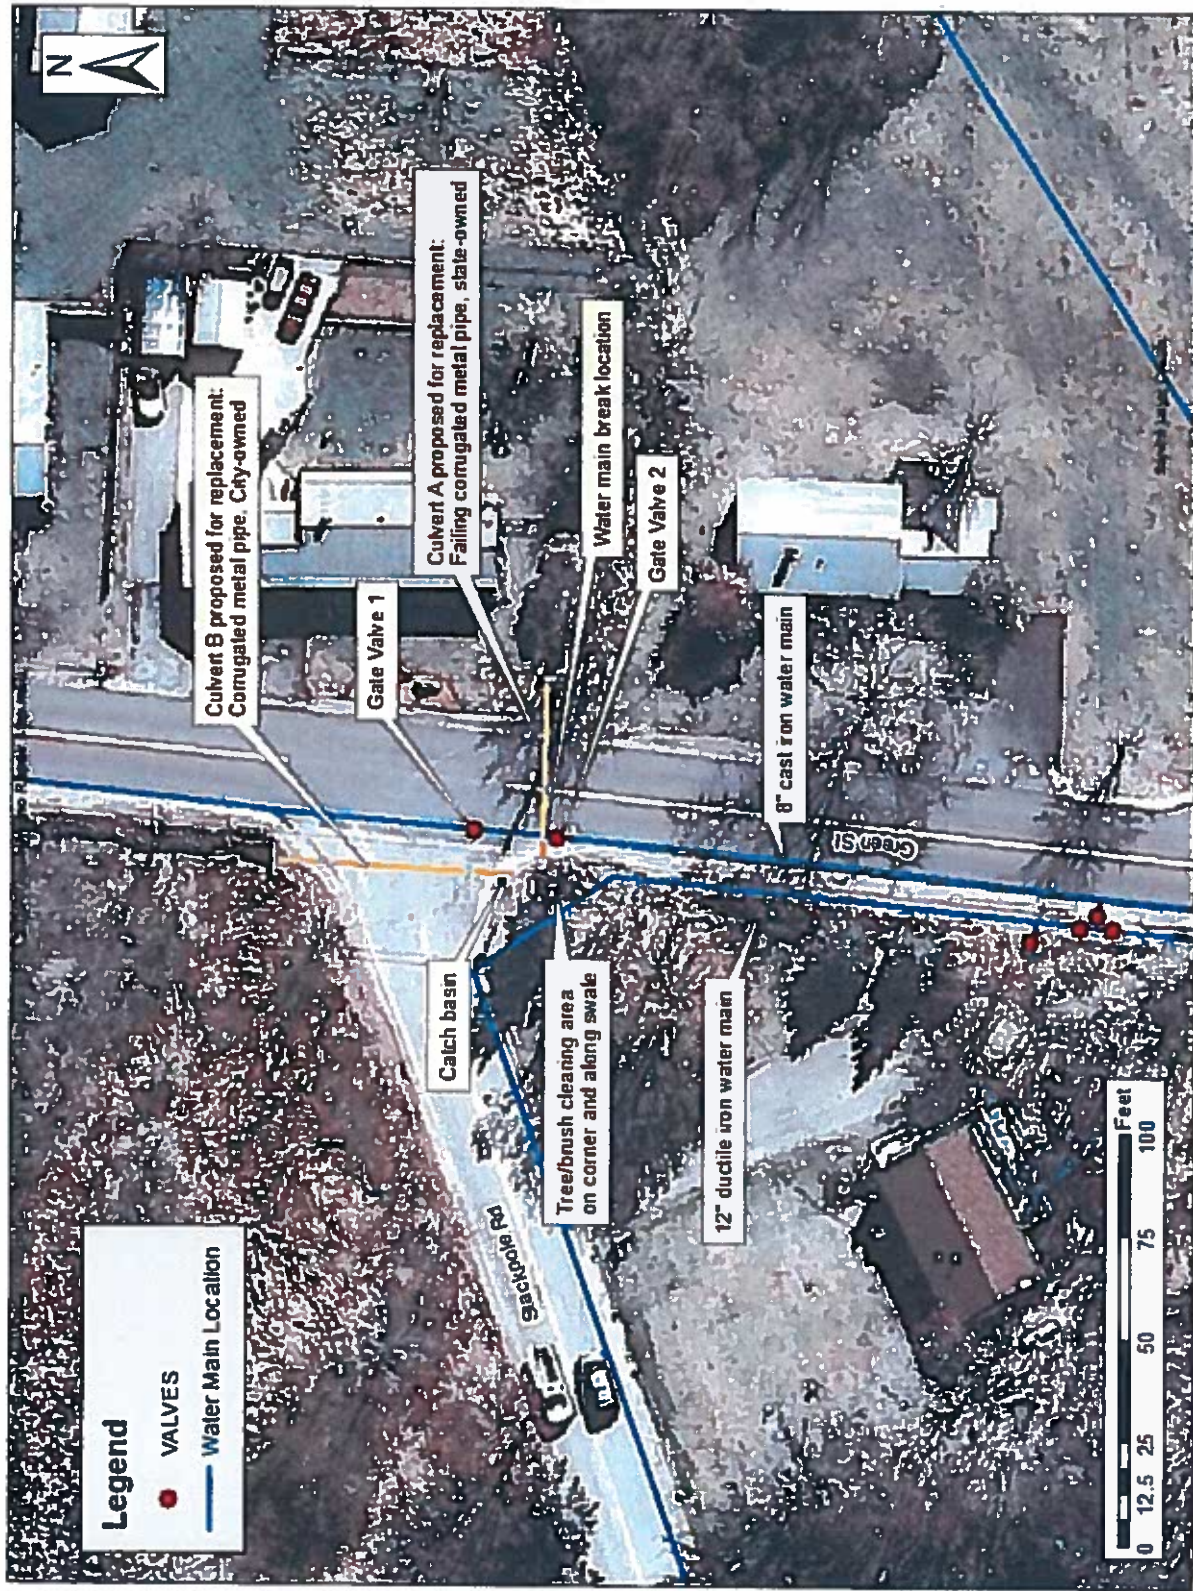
Green Street and Stackpole Road Water Main and Drainage Improvement Site Map
